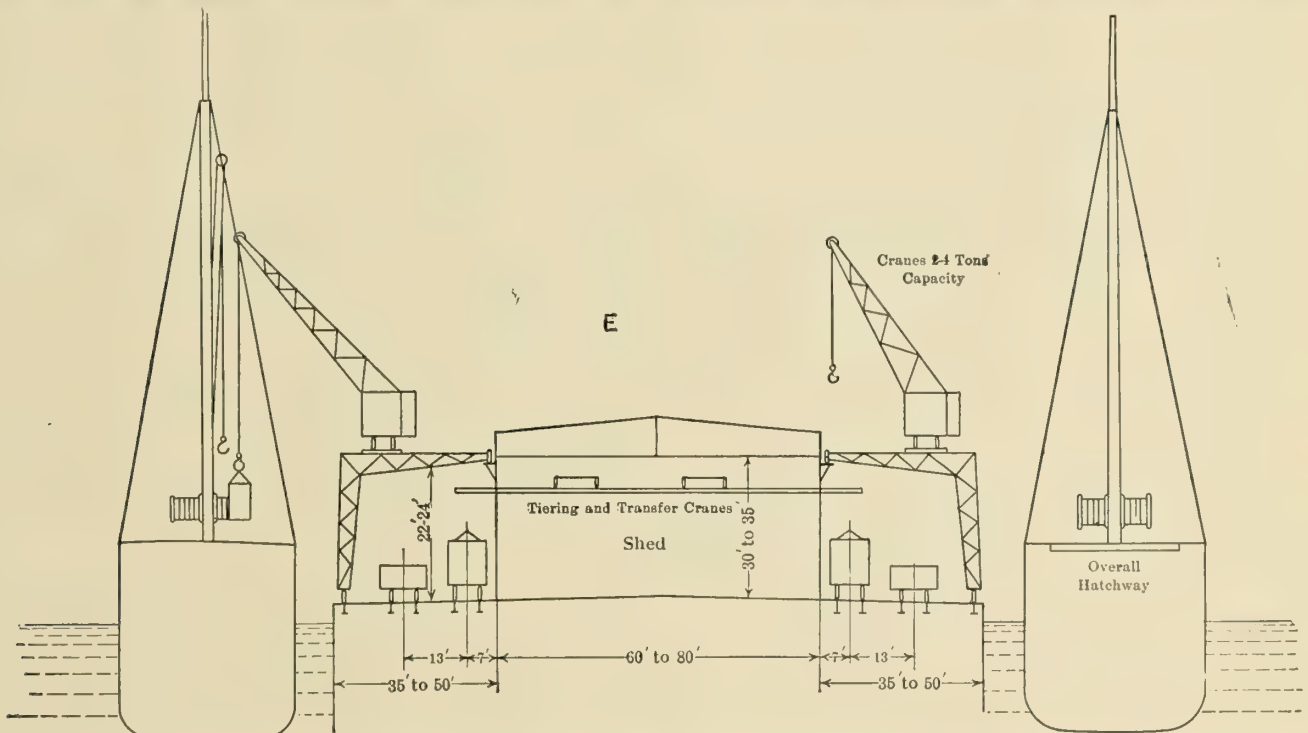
Cross Section of Pier (B-B, Fig. 2) Showing Half Arch Gantry Cranes, Transfer Shed with Tying Machinery and Location of Railroad Tracks
